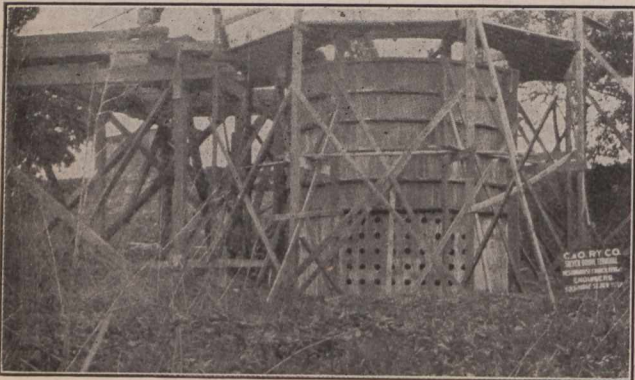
Lower Part of Shaft Before Sinking, Showing Openings Through Which Water is Admitted.
